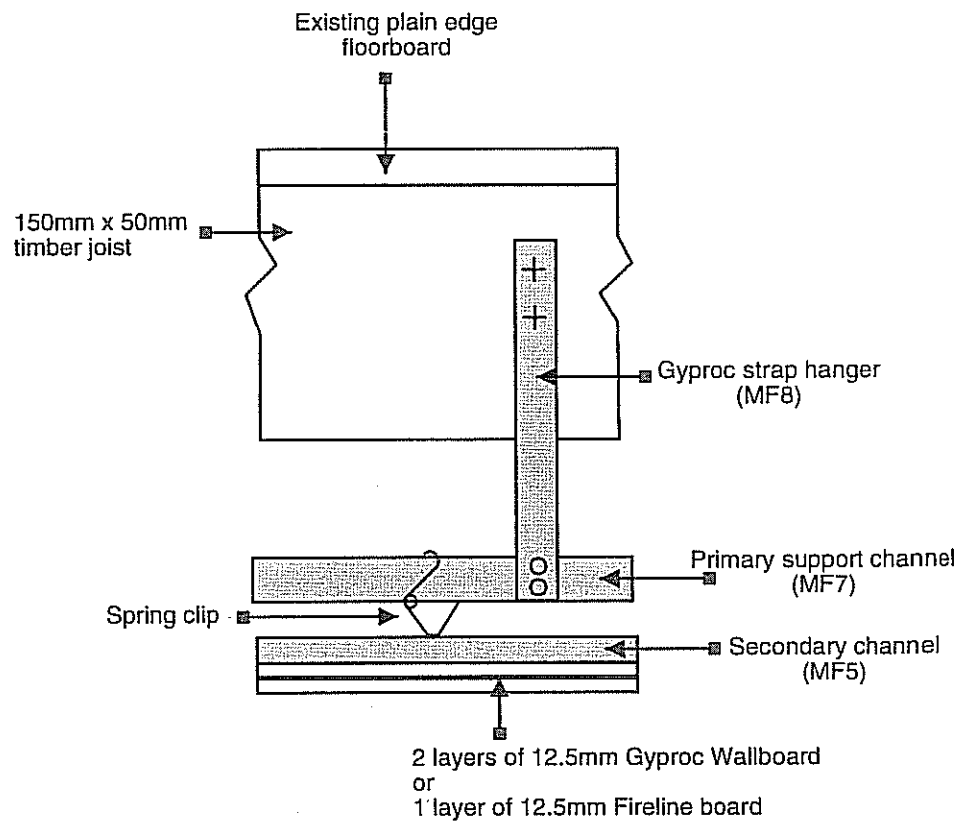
Use of Gyproc Wallboard or Fireline board to provide a suspended ceiling of 30 minutes fire resistance
